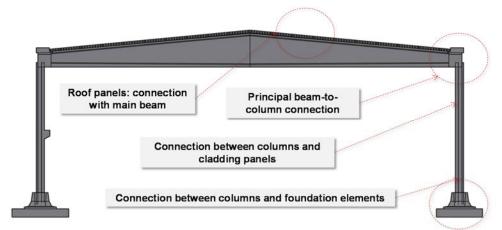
Summarizing scheme of structural problems in r.c. precast traditional buildings.
